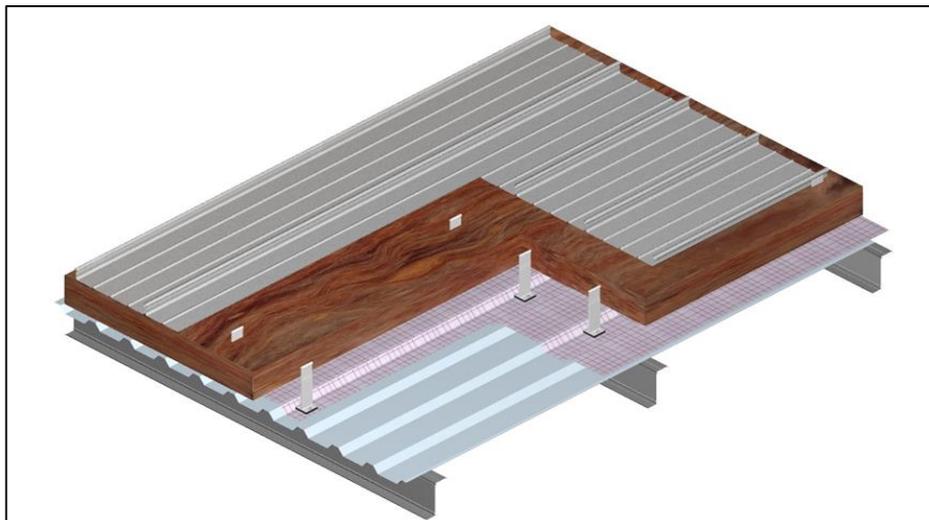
Standing seam system in a double skin liner/purlin roof application (Kalzip)
